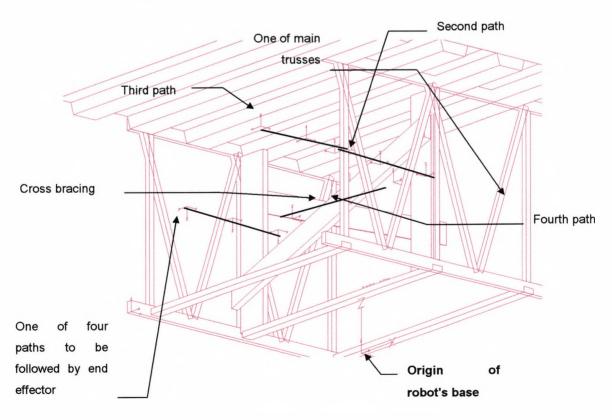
Bridge Detail [B3] according to Table 4.3
